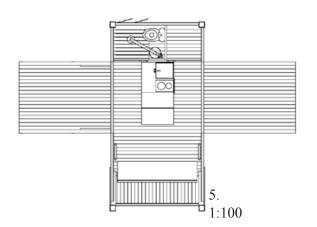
05. (Opposite) Floor plans showing different configurations and ways to use the space.
